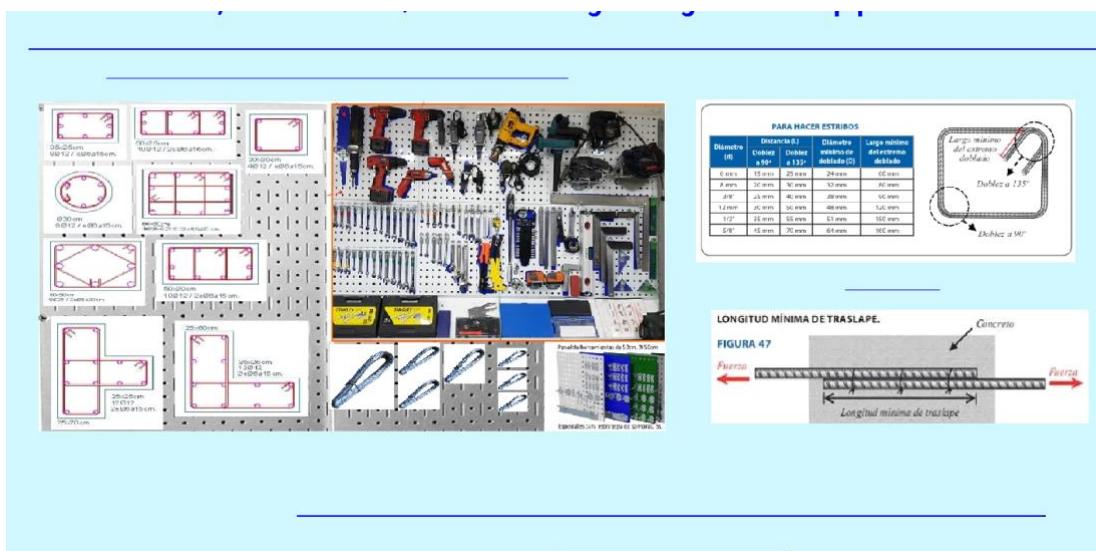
Board No.2: Reinforcement of structural elements with reinforcing steel
